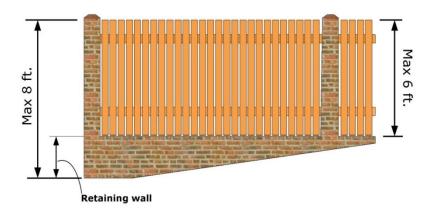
Fence and Retaining Wall Combination; 17.6.6.2:H
